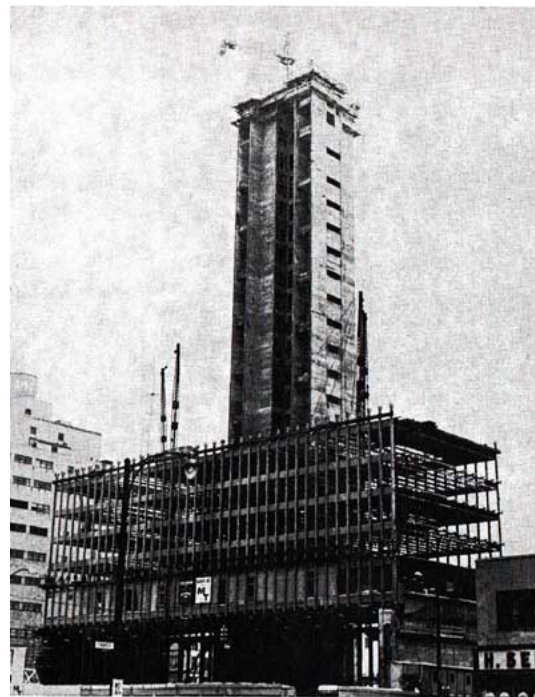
M&T Plaza under construction, March 1966. The steel frame exterior with no interior columns and completed 21-story central service core is visible.
